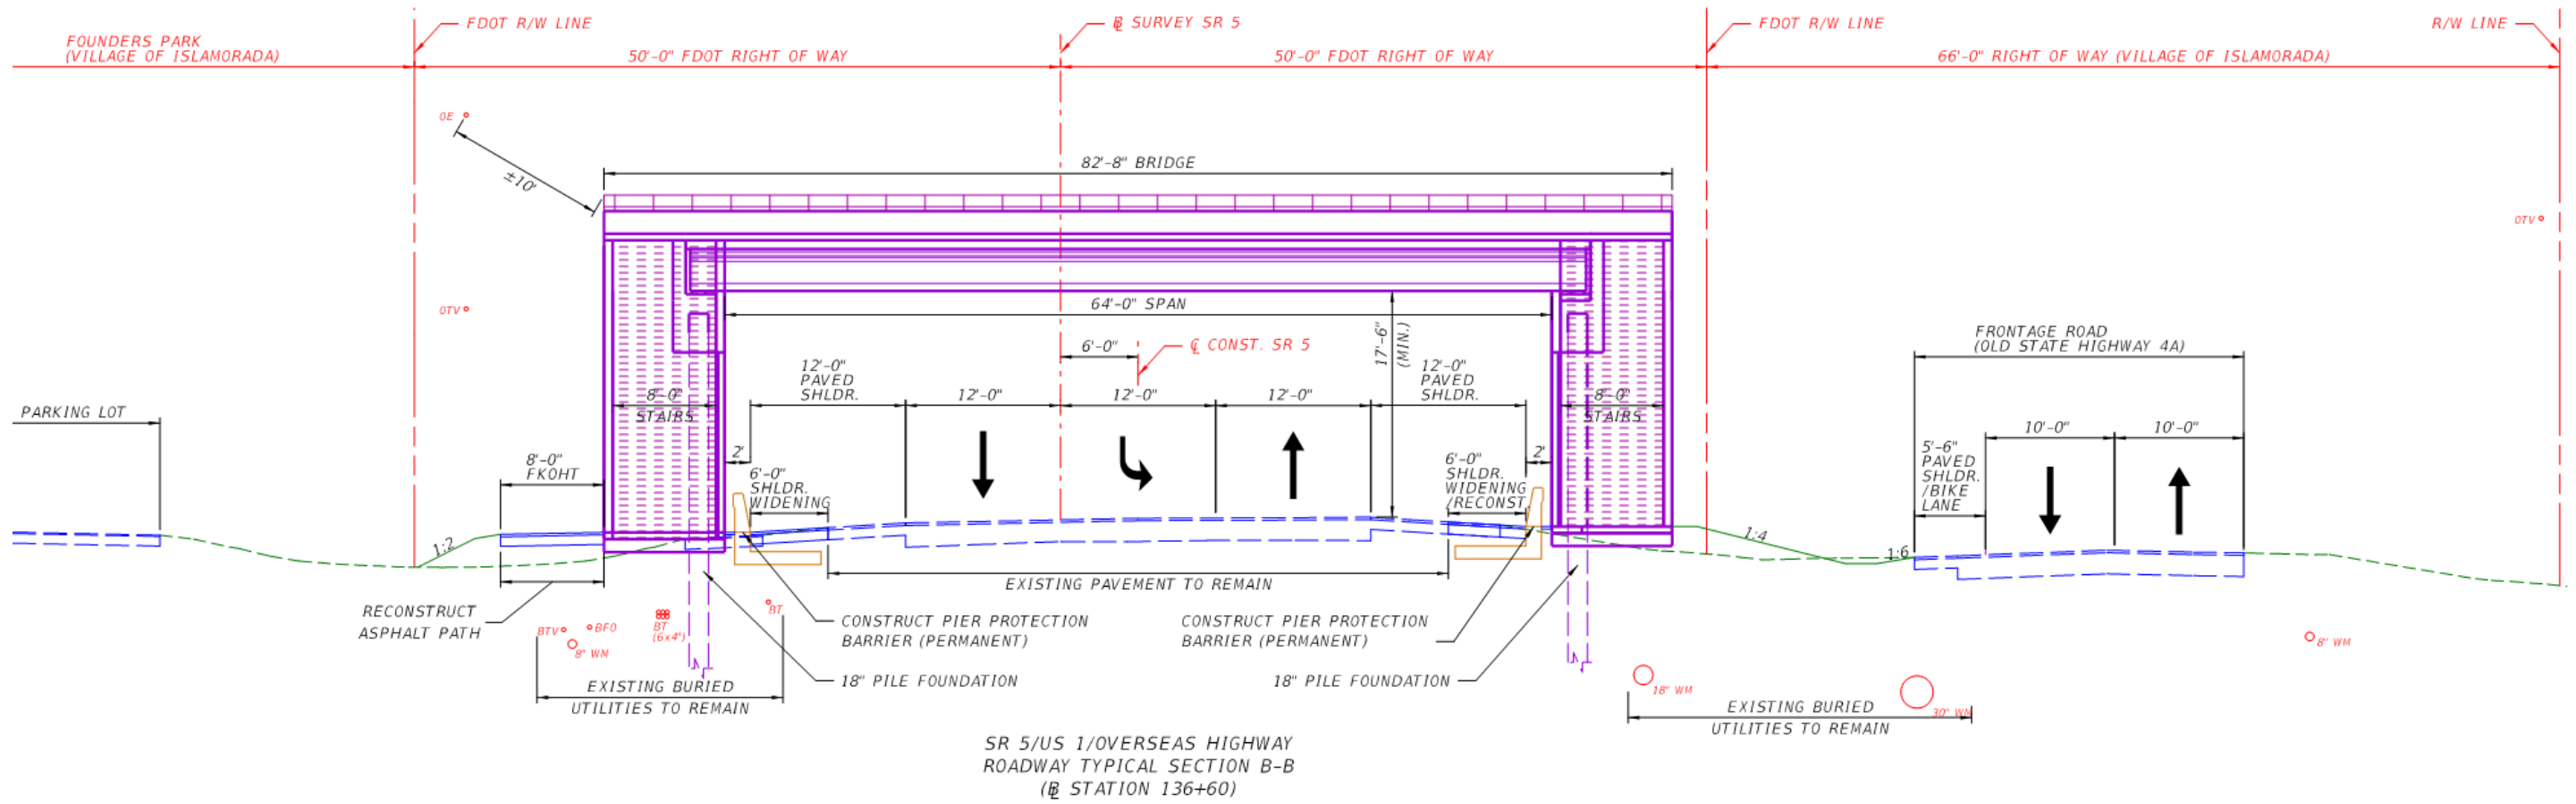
Location 1 Permanent Pedestrian Bridge Concept – Structural Plan & Elevation
